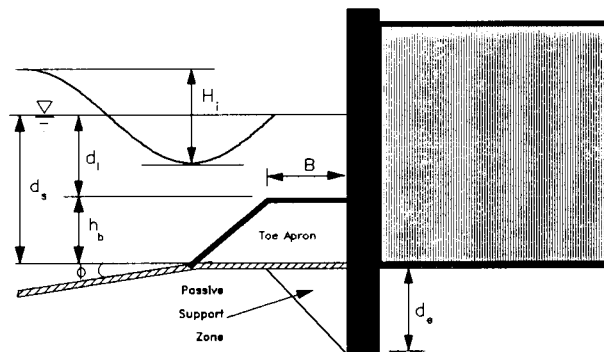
Typical Toe Apron for Sheet-Pile Walls
